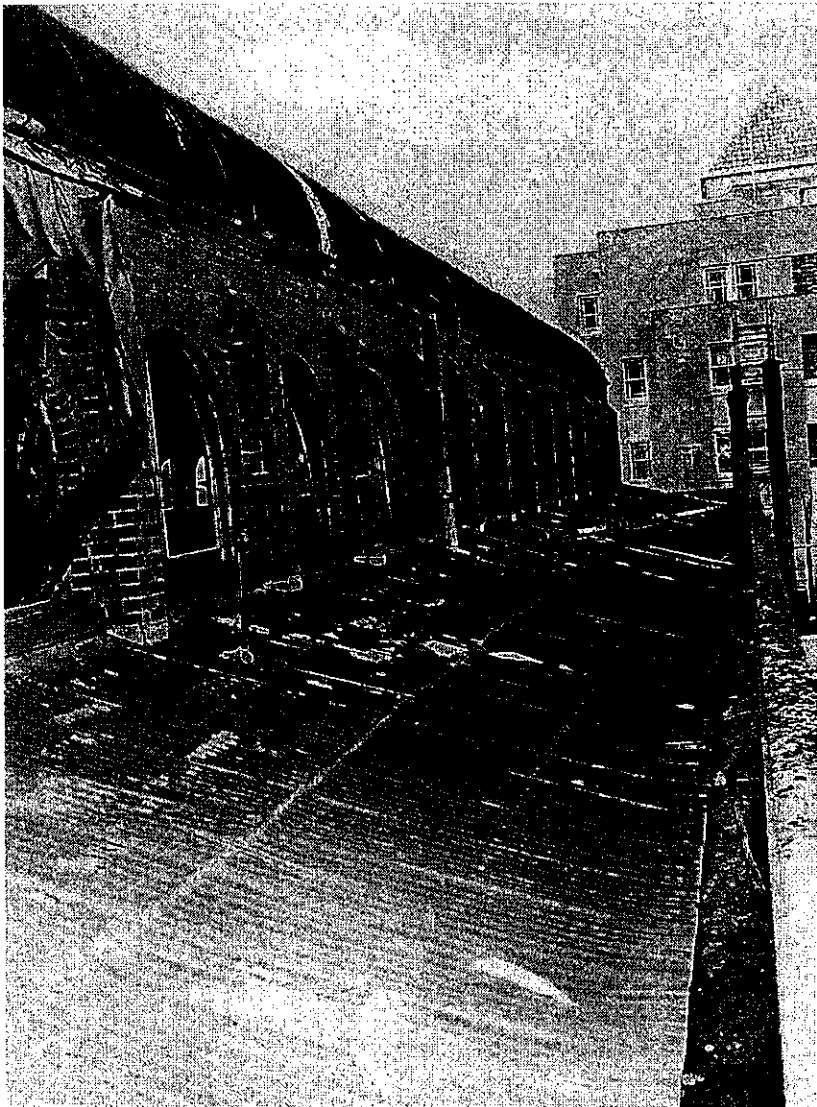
Exterior detail of Exchange hall clerestory windows, north elevation, c.1974. Note the damage/deterioration of the windows at that time. Source: City of Ballarat files..
